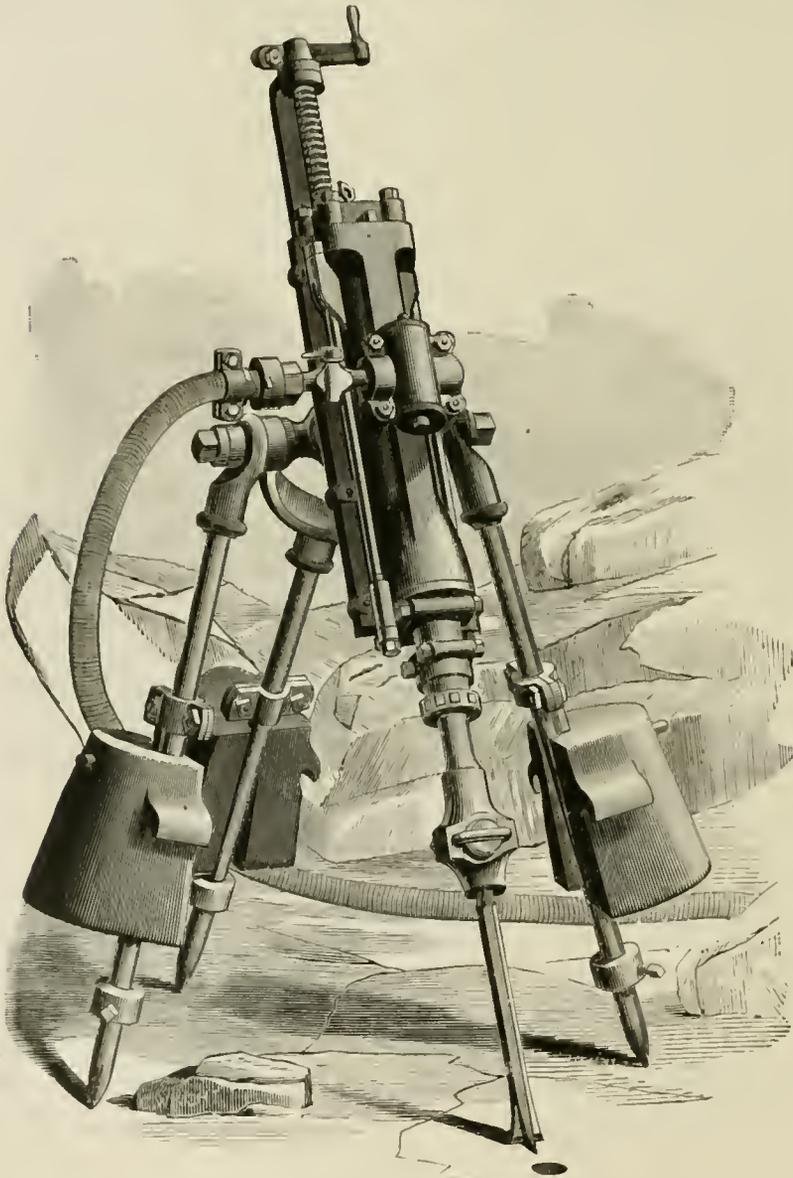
Ingersoll Drill mounted on Tripod for Surface Work, Stopping, etc.
